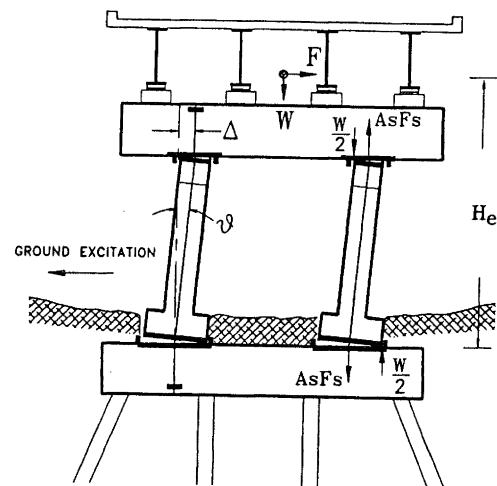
Precast concrete bridge pier with armored dry-jointed rocking connections.
